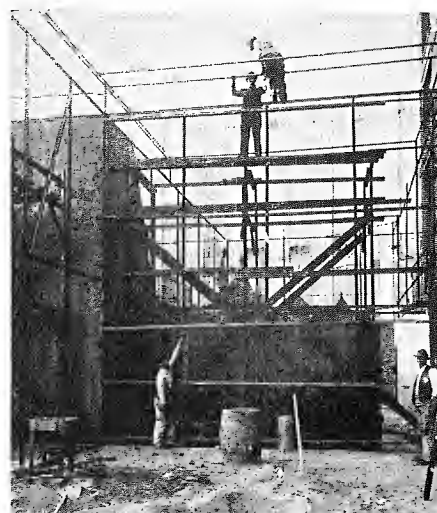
Deep Rib Lath Used In Combination With Concrete-Stucco for Exterior Walls.
